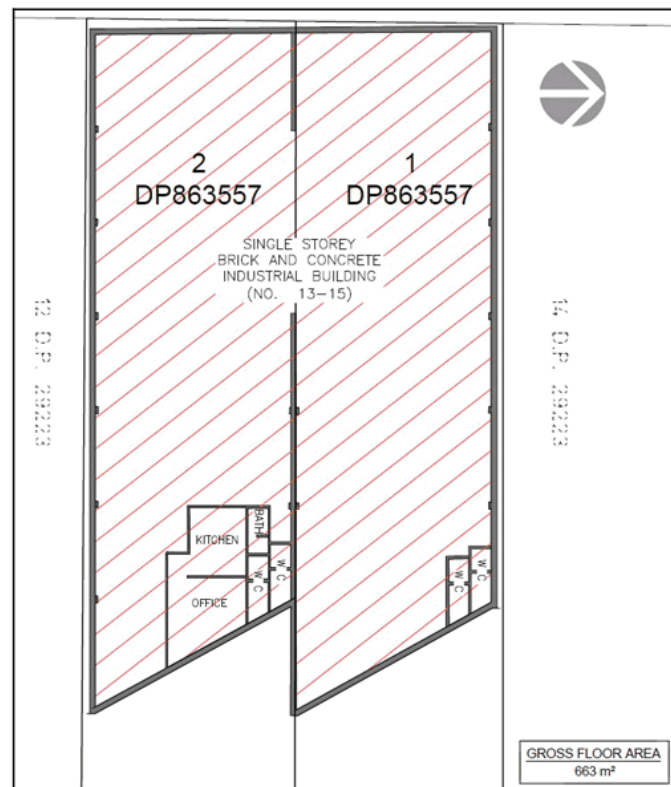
Diagram showing the Gross Floor Area of the existing building on the Site.
